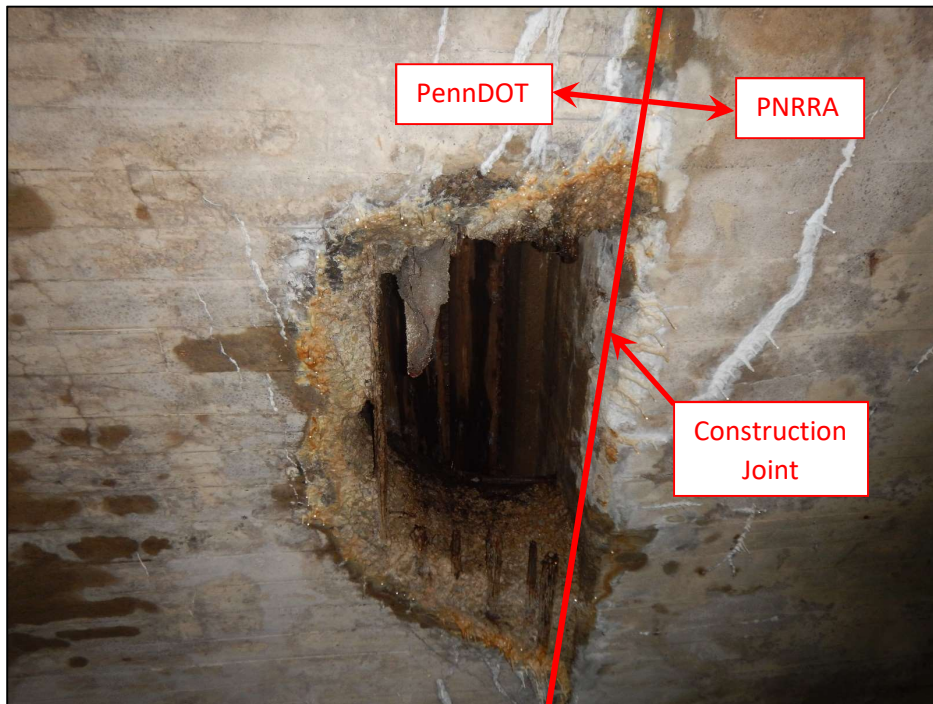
Heavily deteriorated drainage inlet through the top slab in Span 1 of the PennDOT section at the construction joint.
